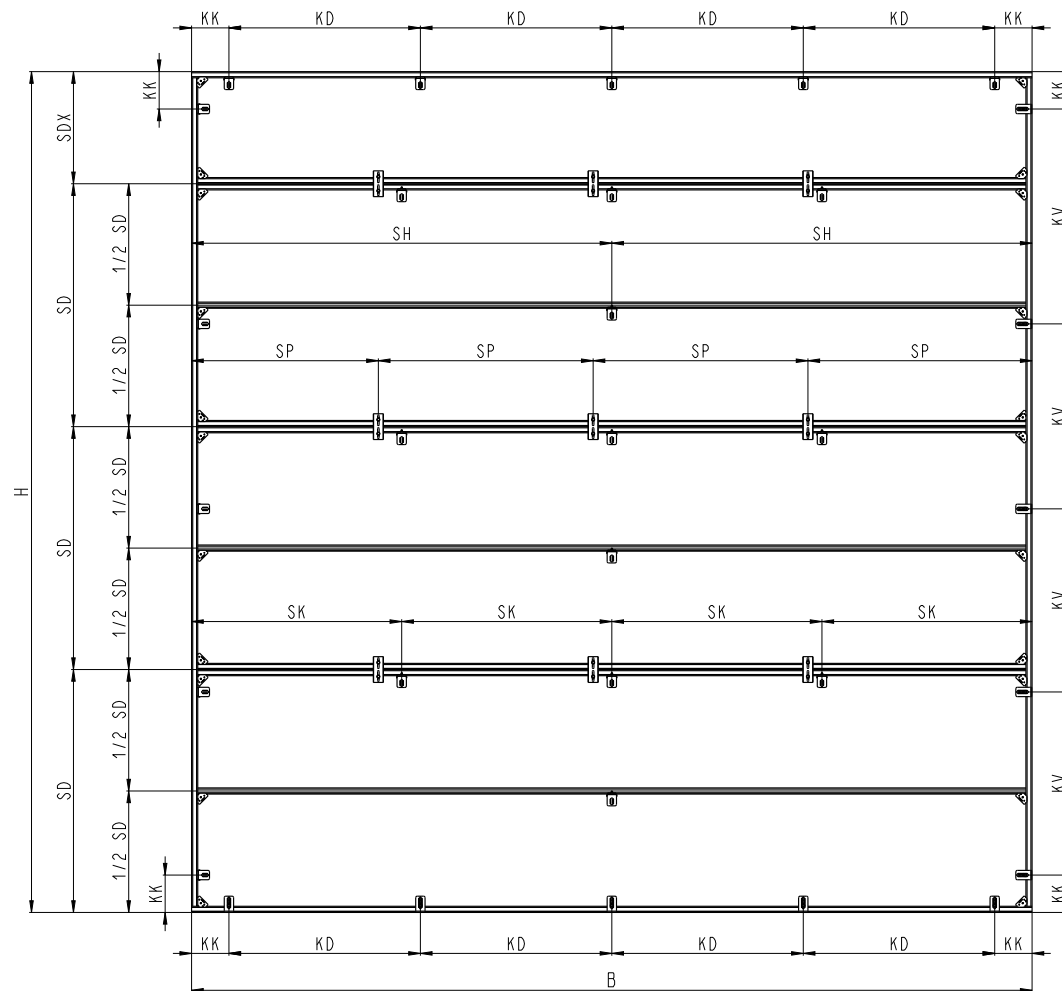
The principle of assembling the basic blocks of walls into the resulting structure wider than 4,5 m
